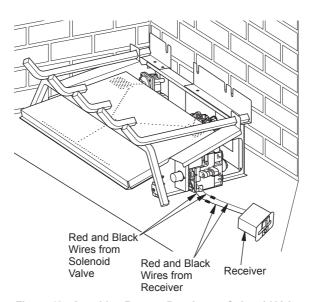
Attaching Remote Receiver to Solenoid Valve
